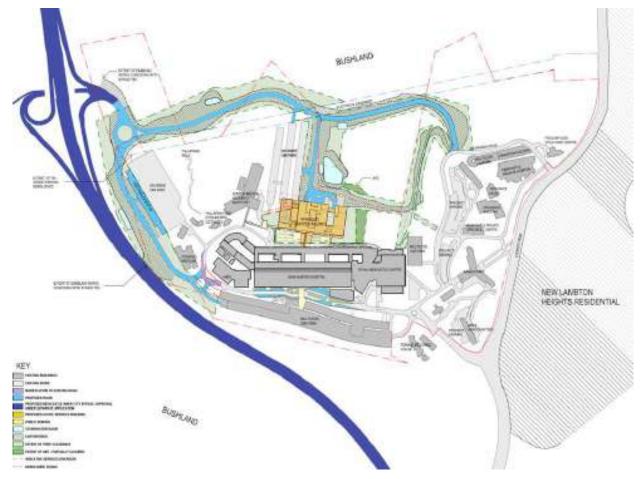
Excerpt from Proposed Site Plan. (BVN Architects, 16 February 2021).
